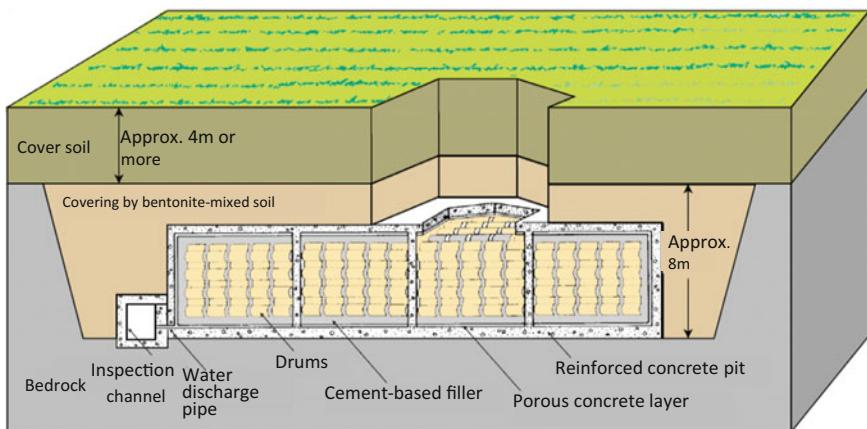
Concept of near-surface concrete-pit disposal [5]
